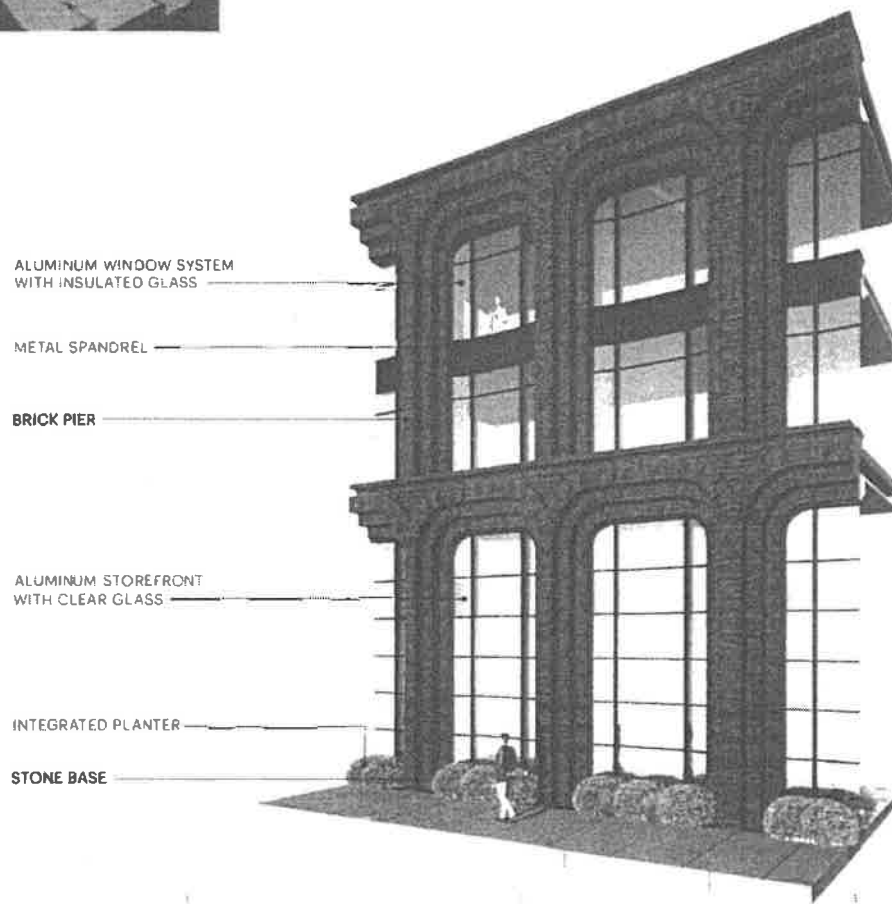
A : FACADE AXON DETAILS (PODIUM LEVELS)
